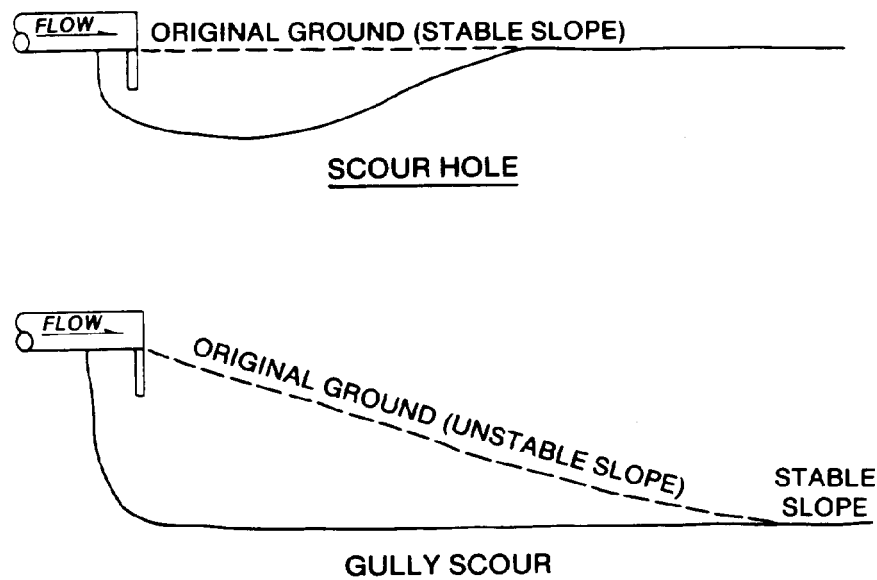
Types of scour at storm-drain and culvert outlets.
